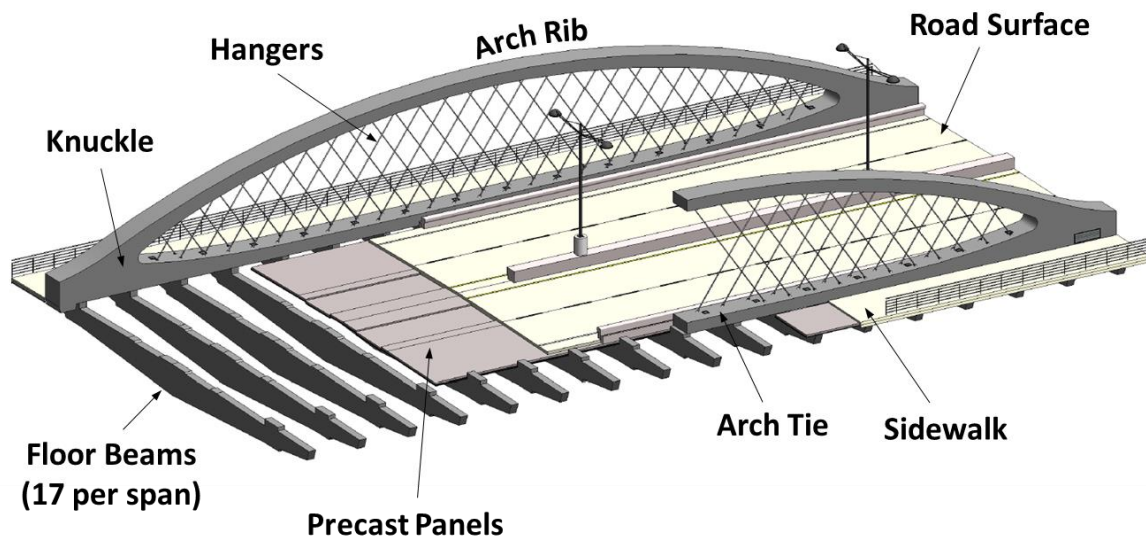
Details of a typical span in the West 7<sup>th</sup> Street Bridge
